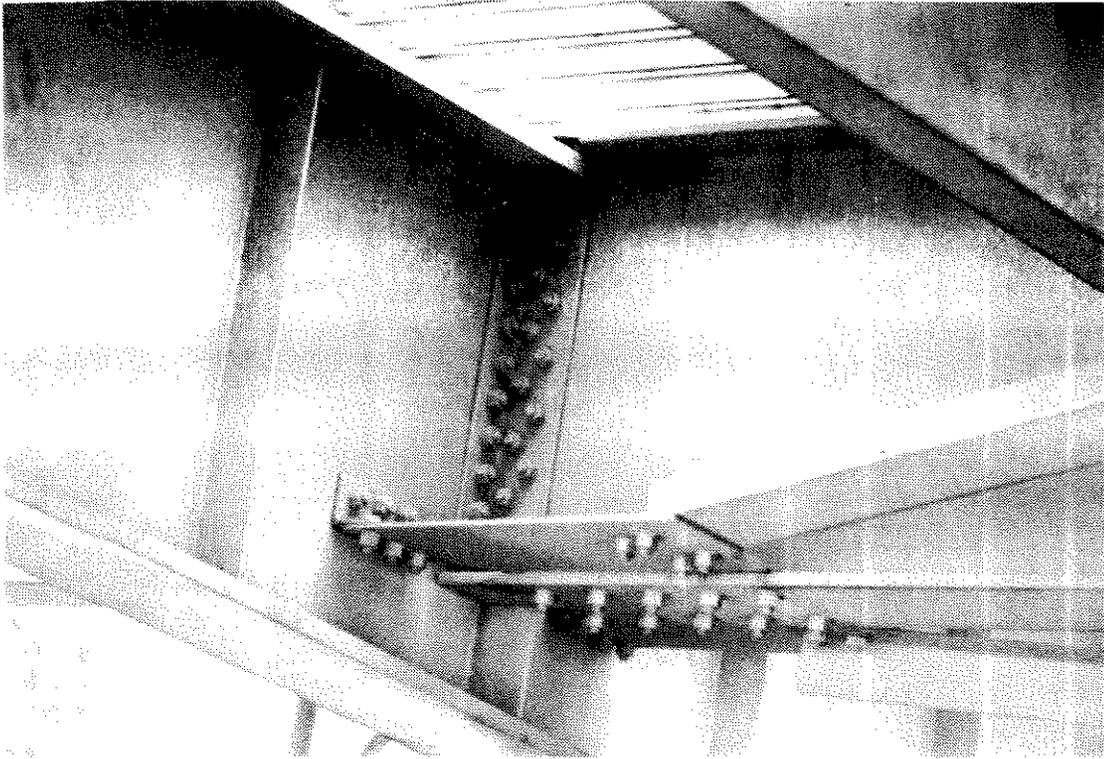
FRICTION CONNECTION OF FLOOR BEAM AND MAIN GIRDER
